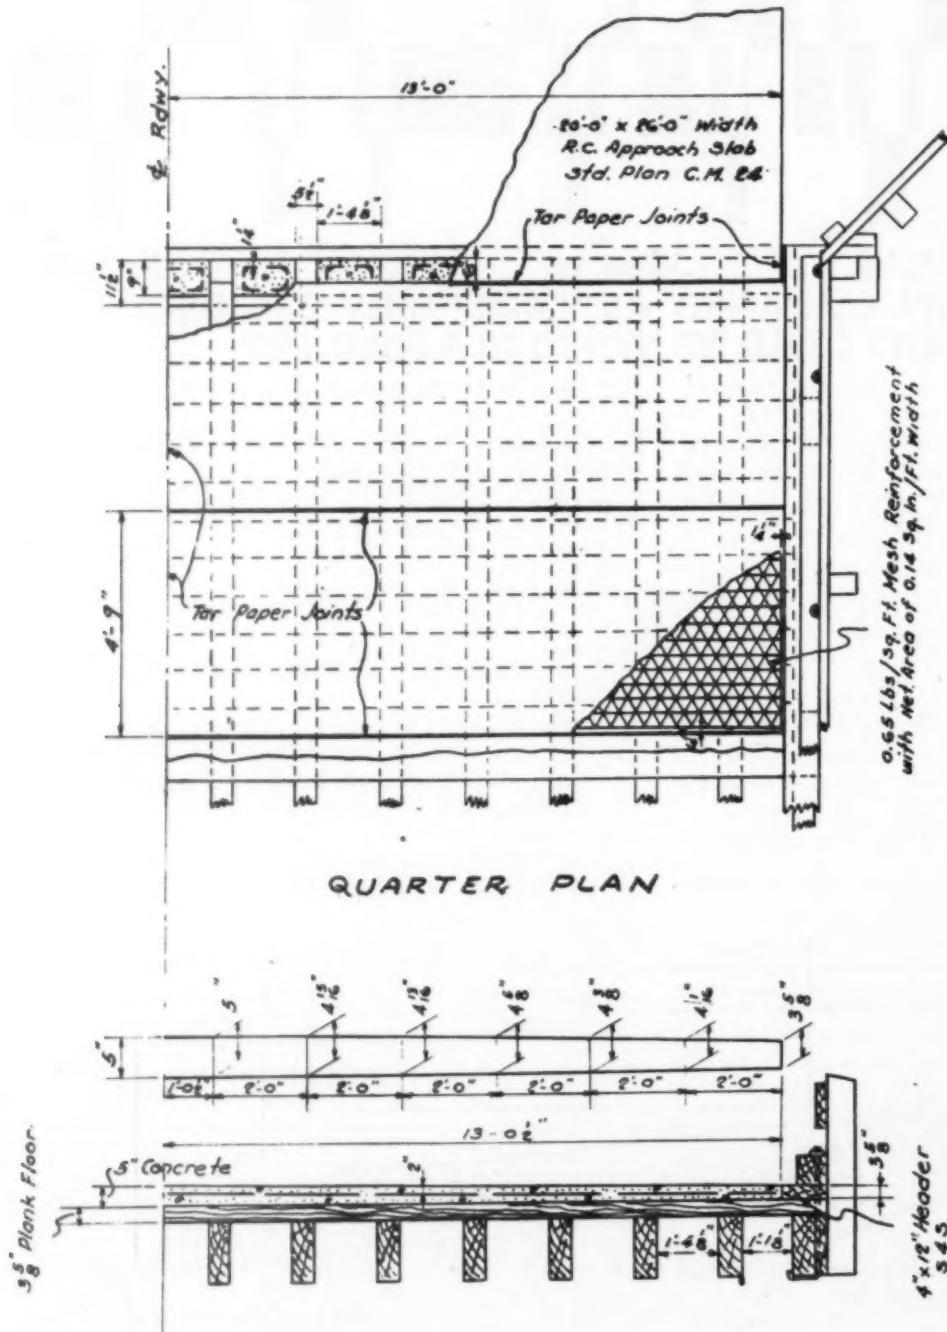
Section Views of Bridge Floor on Trestle Spans
